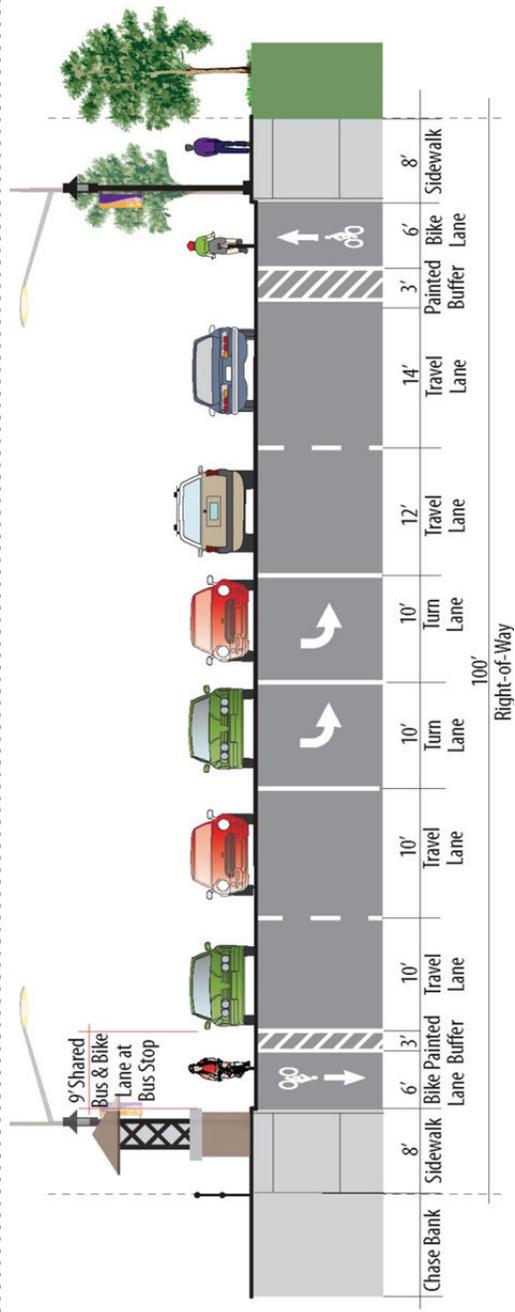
Proposed Bikeway Improvements, Section E – Thousand Oaks Boulevard
